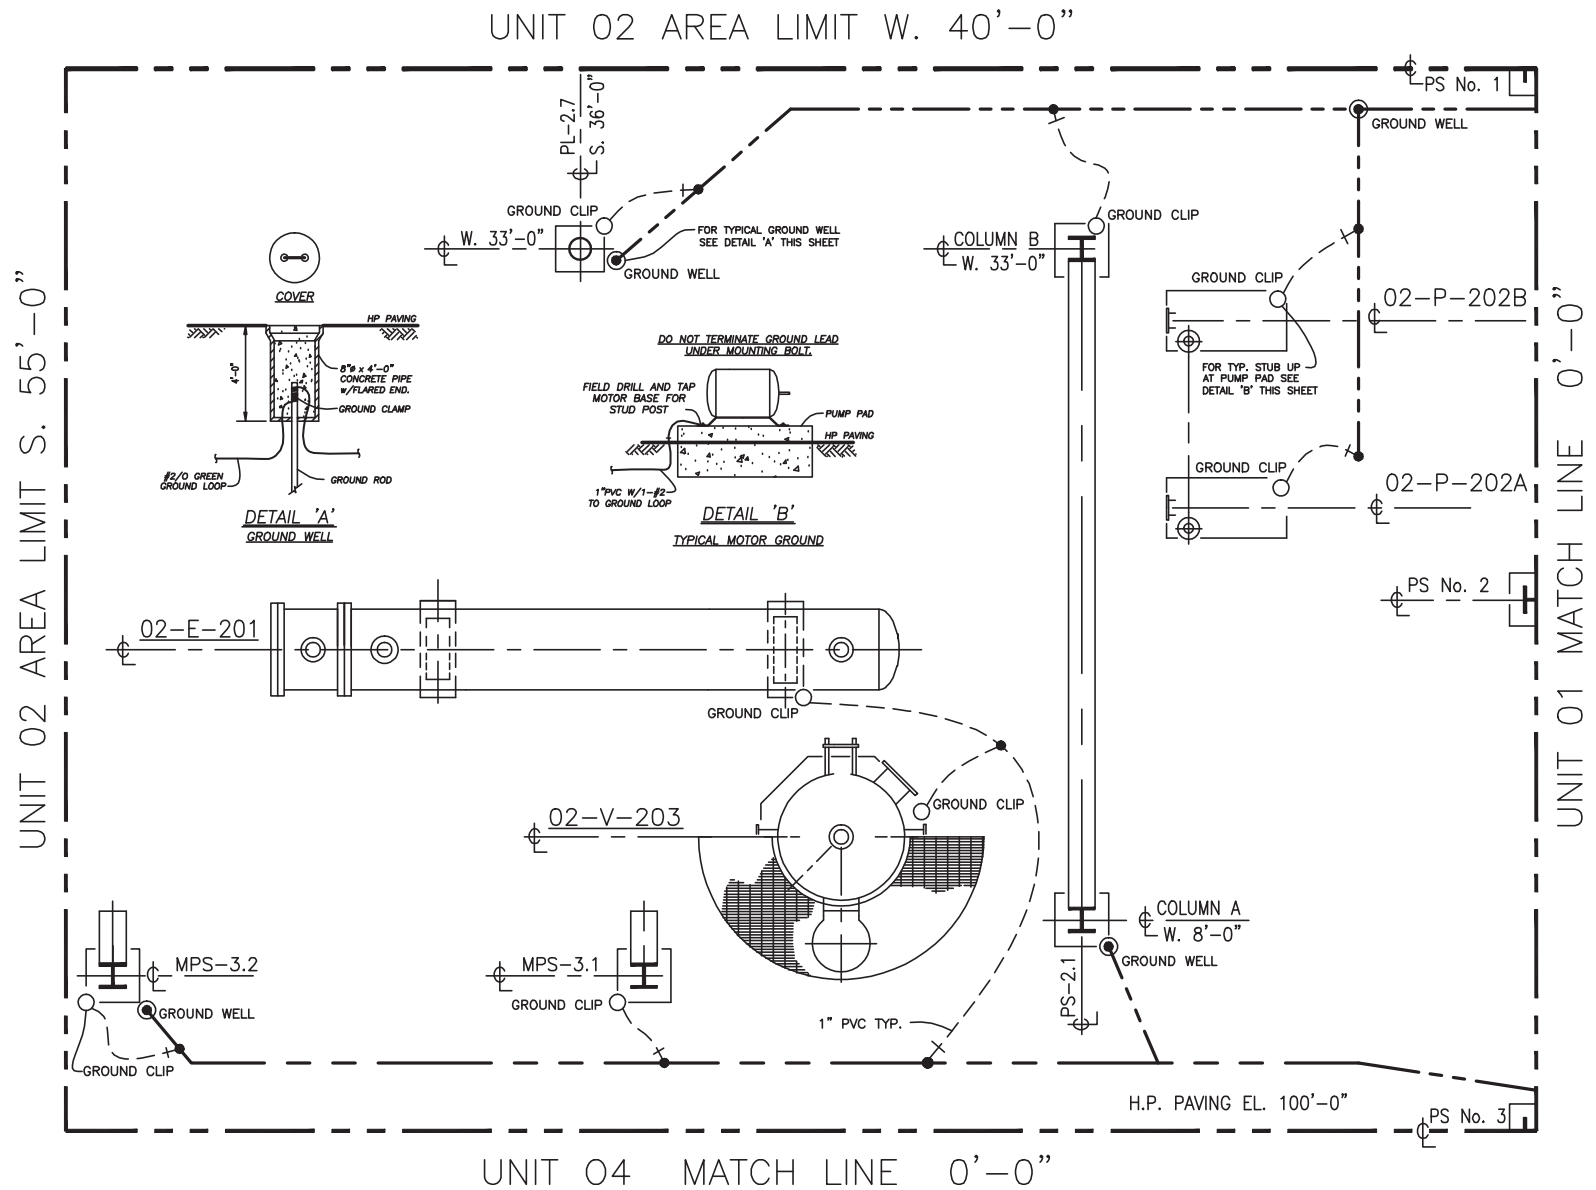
Unit-02: Electrical: Grounding Plan.
